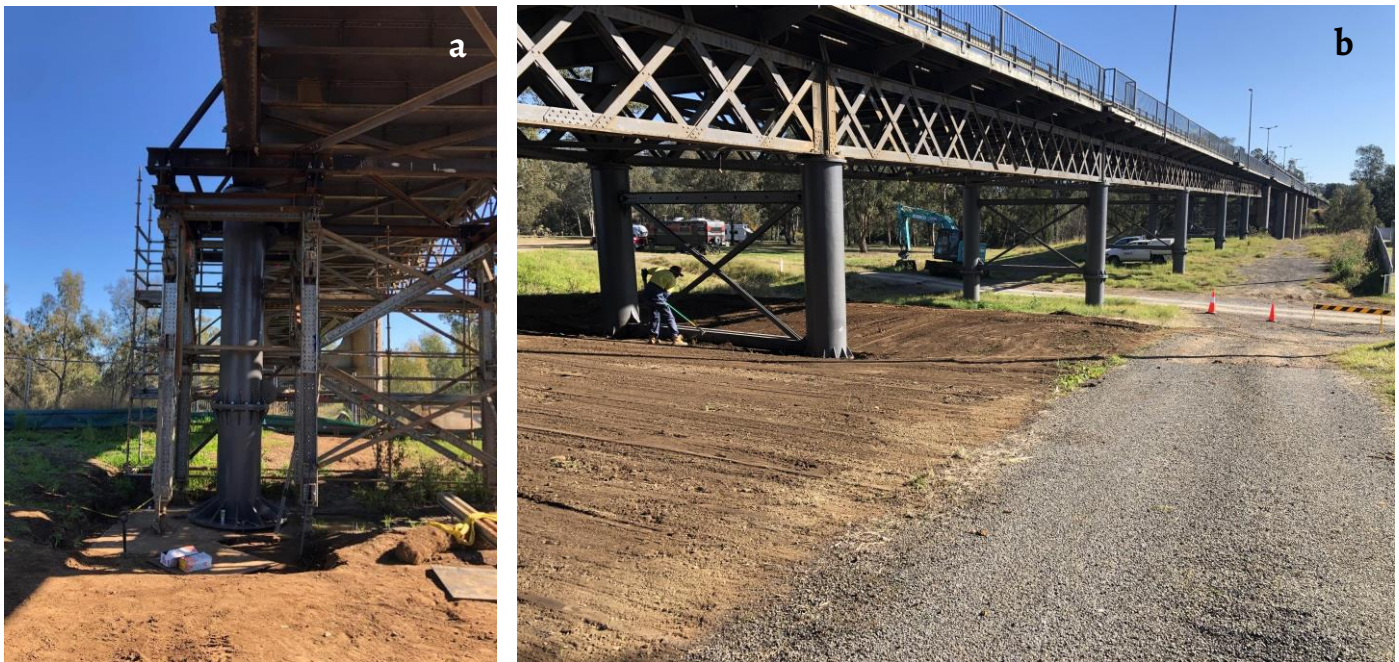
Bridge: a) completed column; b) new piers in place (photos: A. Rosnell, 2021).
